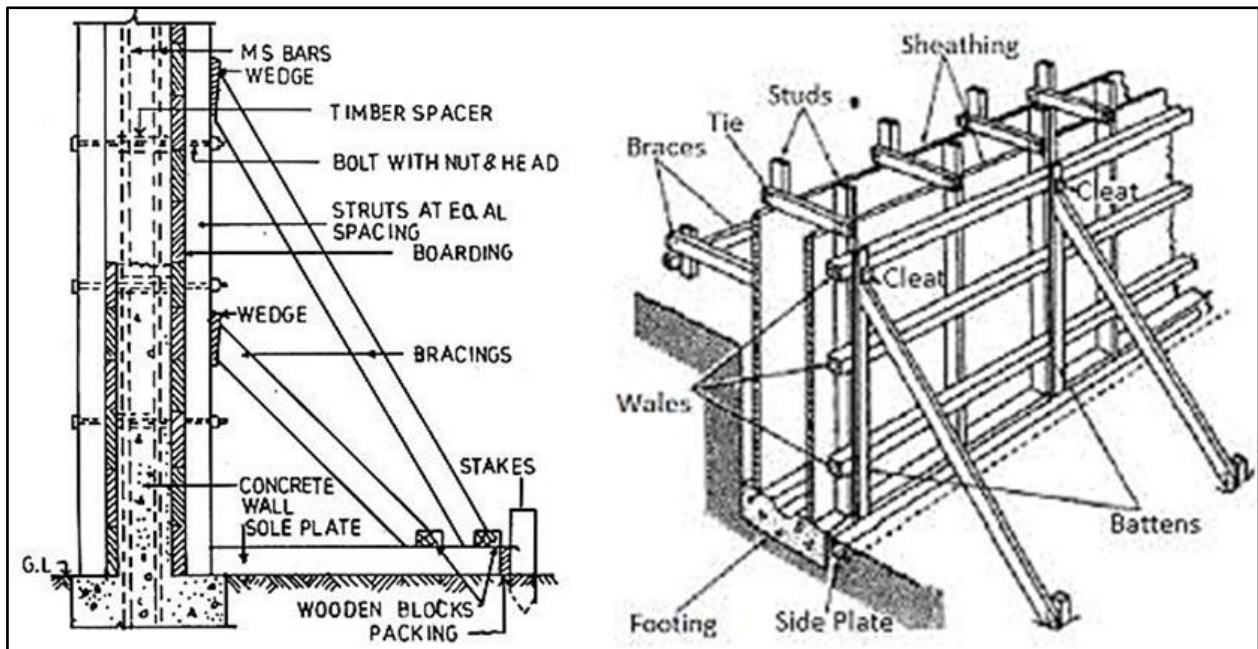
A typical formwork set-up for a concrete wall (The Constructor).
